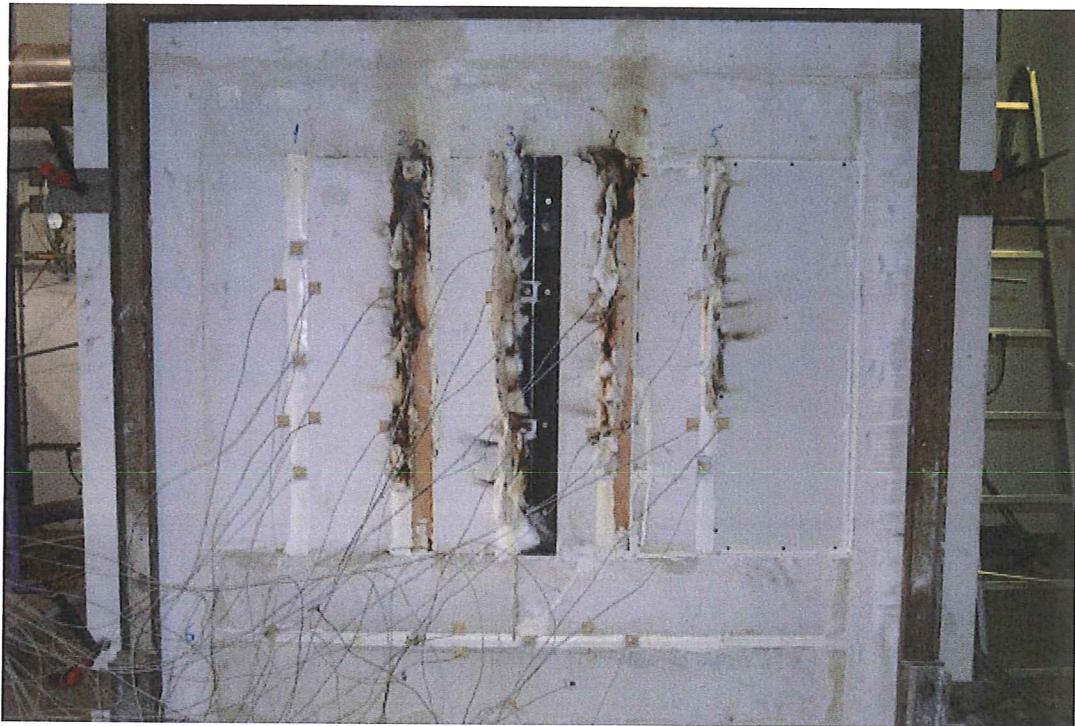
Unexposed side of test specimen after 150 minutes of testing
